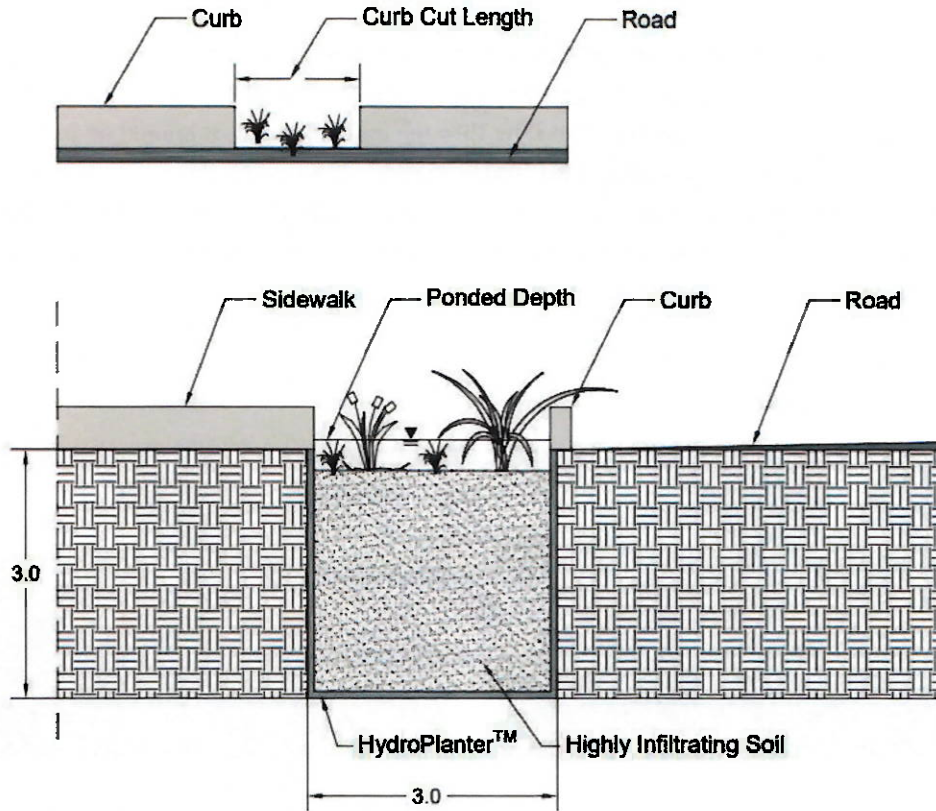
Cross section details for the curb cut rain gardens. Dimensions shown are in feet.
